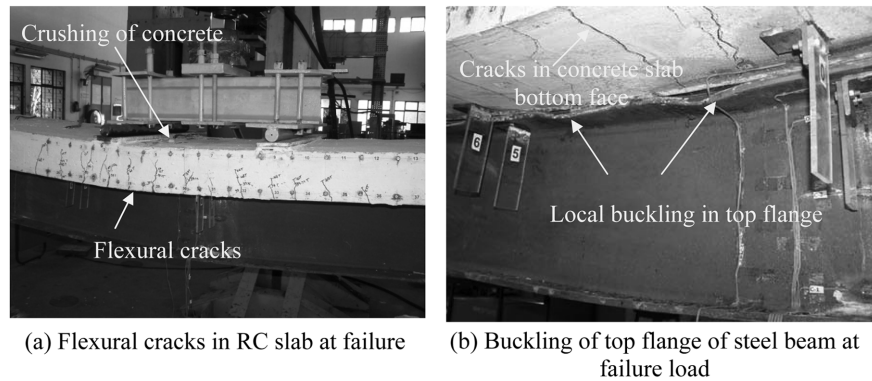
Failure modes in tested SCC girder specimens
